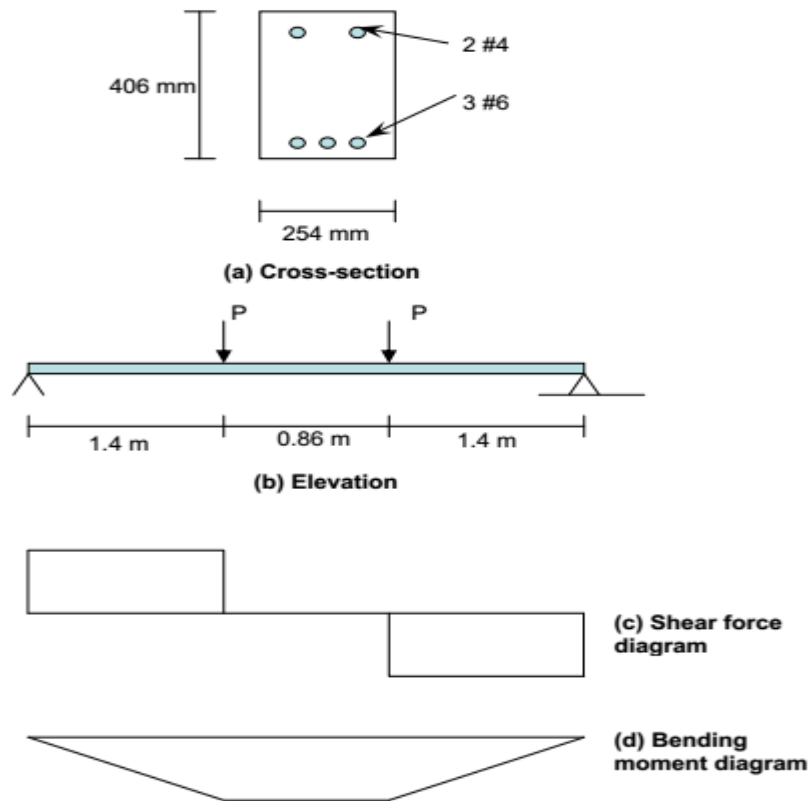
Cross-section, Elevation, Shear Force Diagram, and Bending Moment
